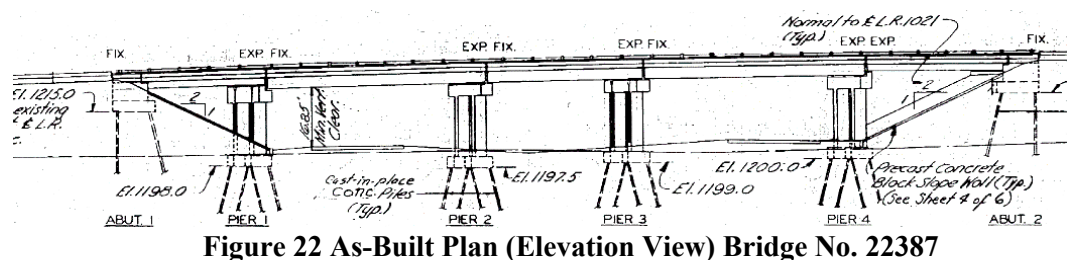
As-Built Plan (Elevation View) Bridge No. 22387
